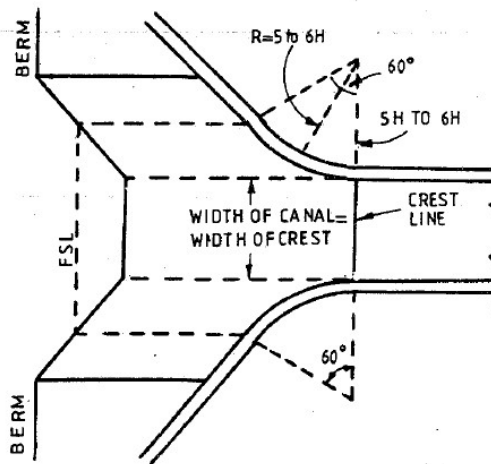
Upstream wing walls for Trapezoidal crest of Sarda Type fall.
